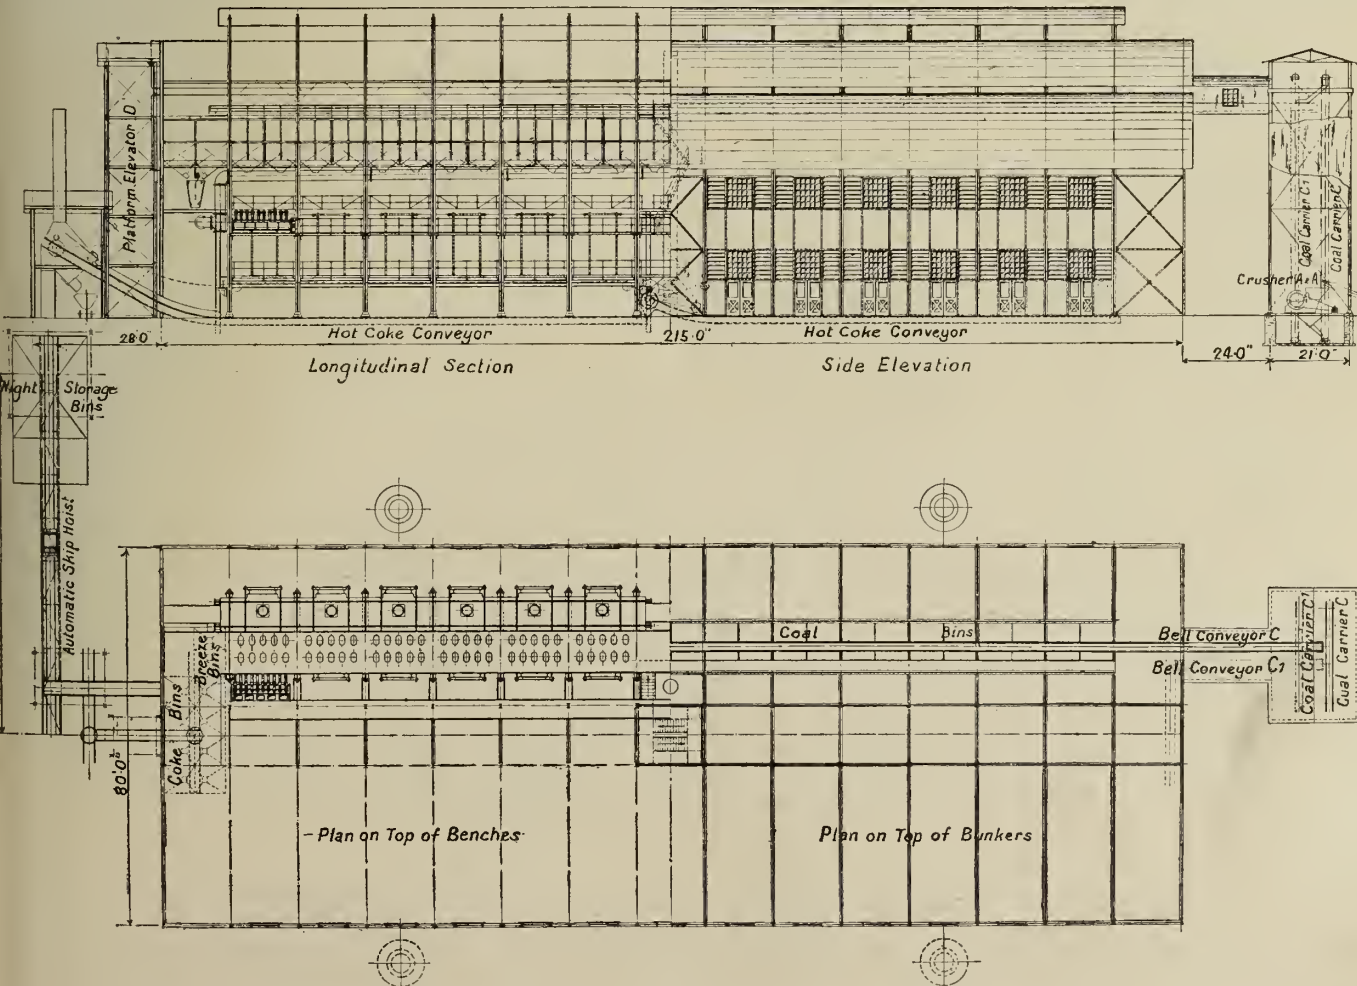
General Plan, Section, and Elevation of the Vertical Retort-House at Providence, U.S.A.
